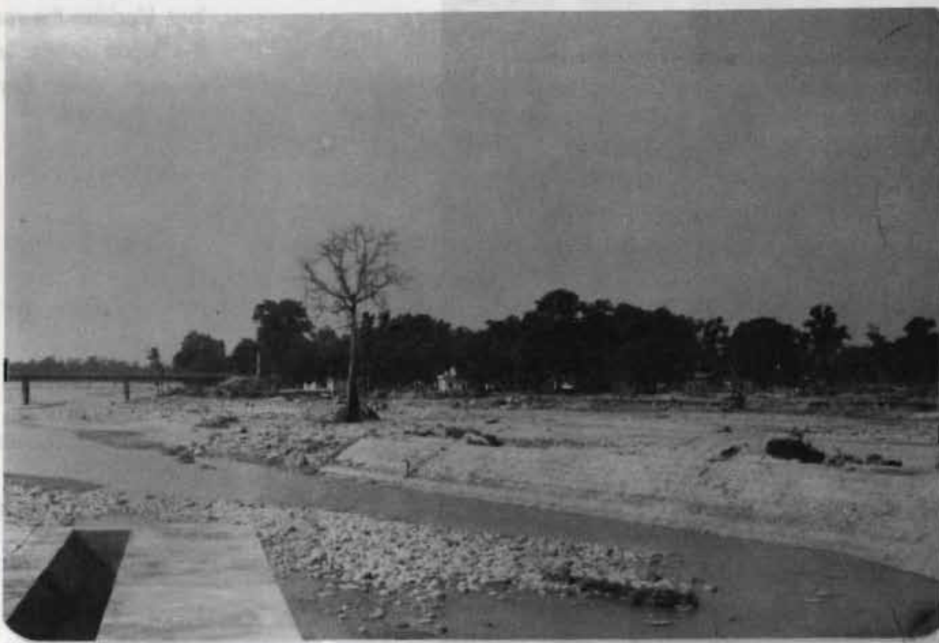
Downstream view from the barrage towards the western bank. Notice the flood water was flowing beyond the houses of the Canteen Bazaar (in the background). View towards the south-west
